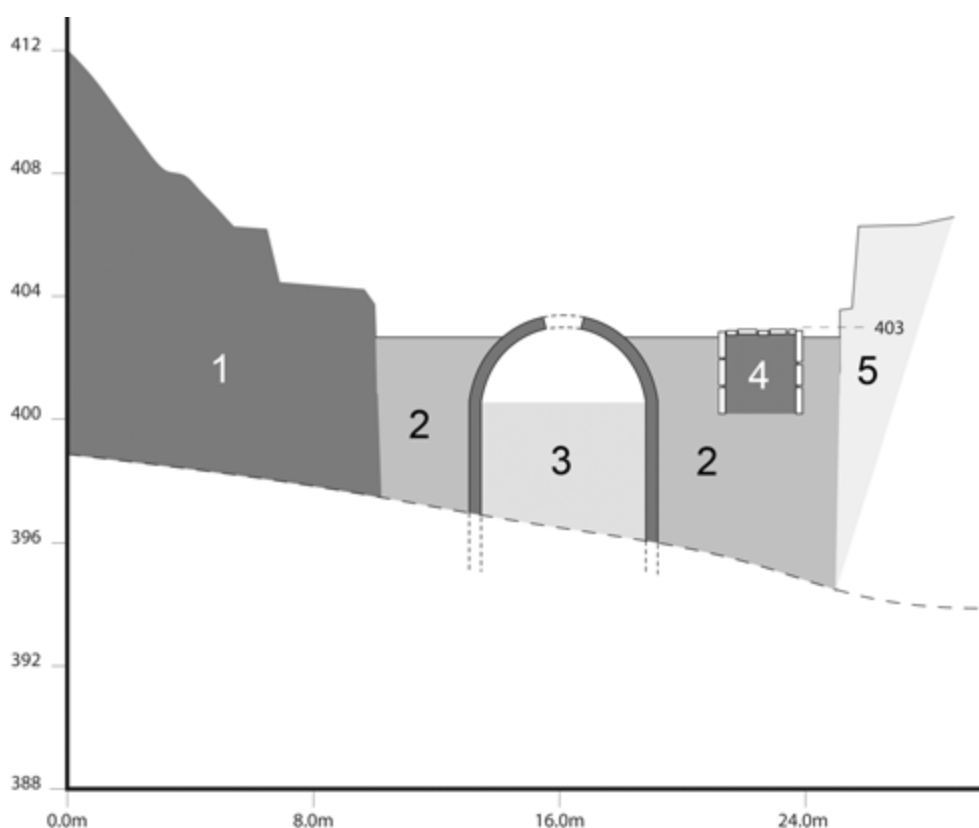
Section trough hydrotechnical complex: 1 – rock, 2 – water collection basin, 3 – water intake facility, 4 – east wall, 5 – sand deposits (drawing A. Nikolić and A. Subotić)
